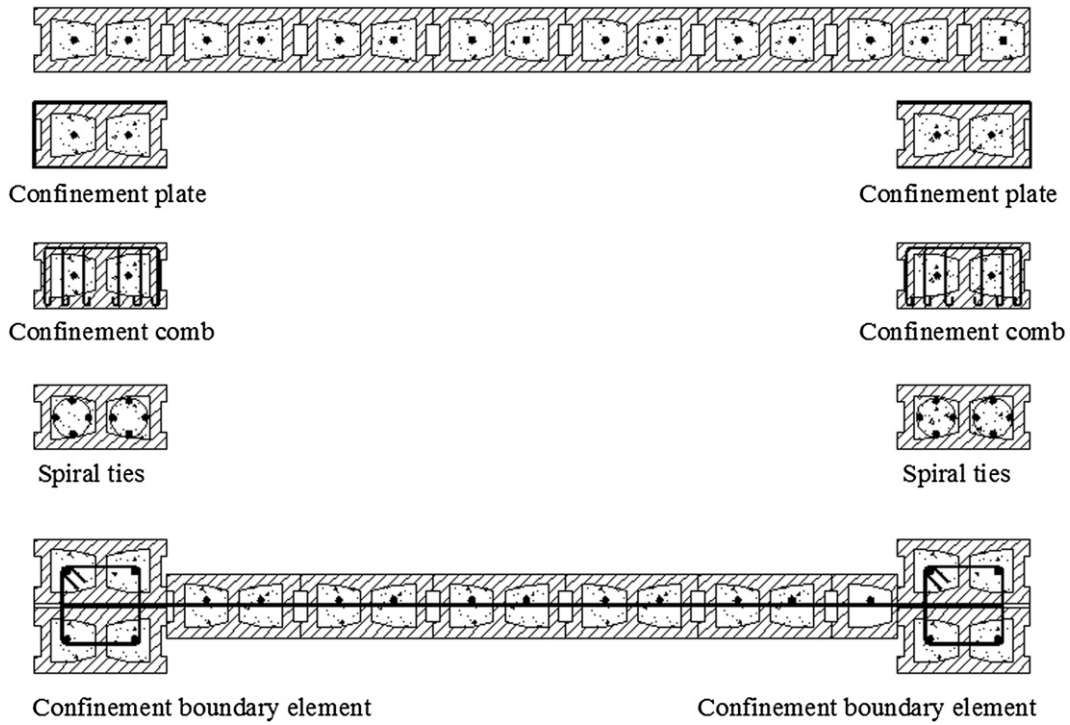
Examples of confinement methods of reinforced masonry construction.
